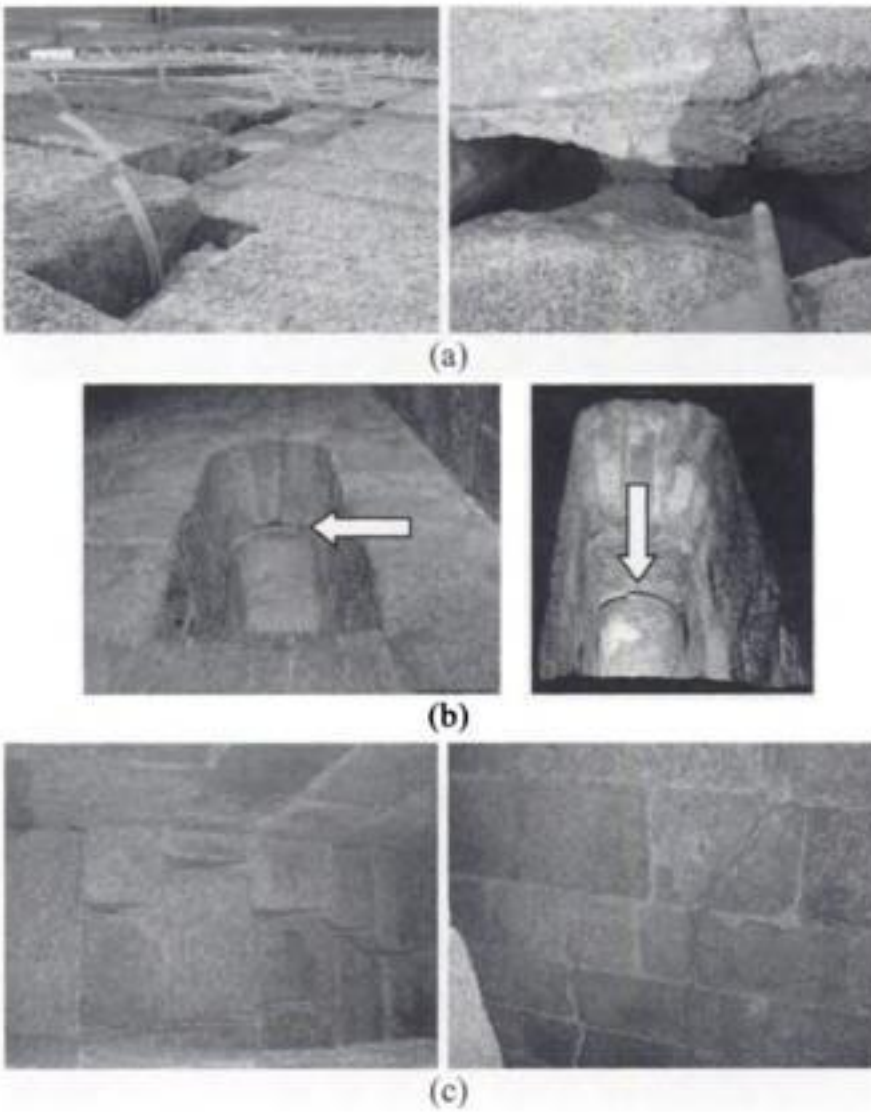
Details of the cracks in the towers: (a) cracks up to 0.20 m width in the South façade/South tower; (b) typical active cracks parallel to the walls at the openings; (c) vertical cracks at the base of the North tower.
